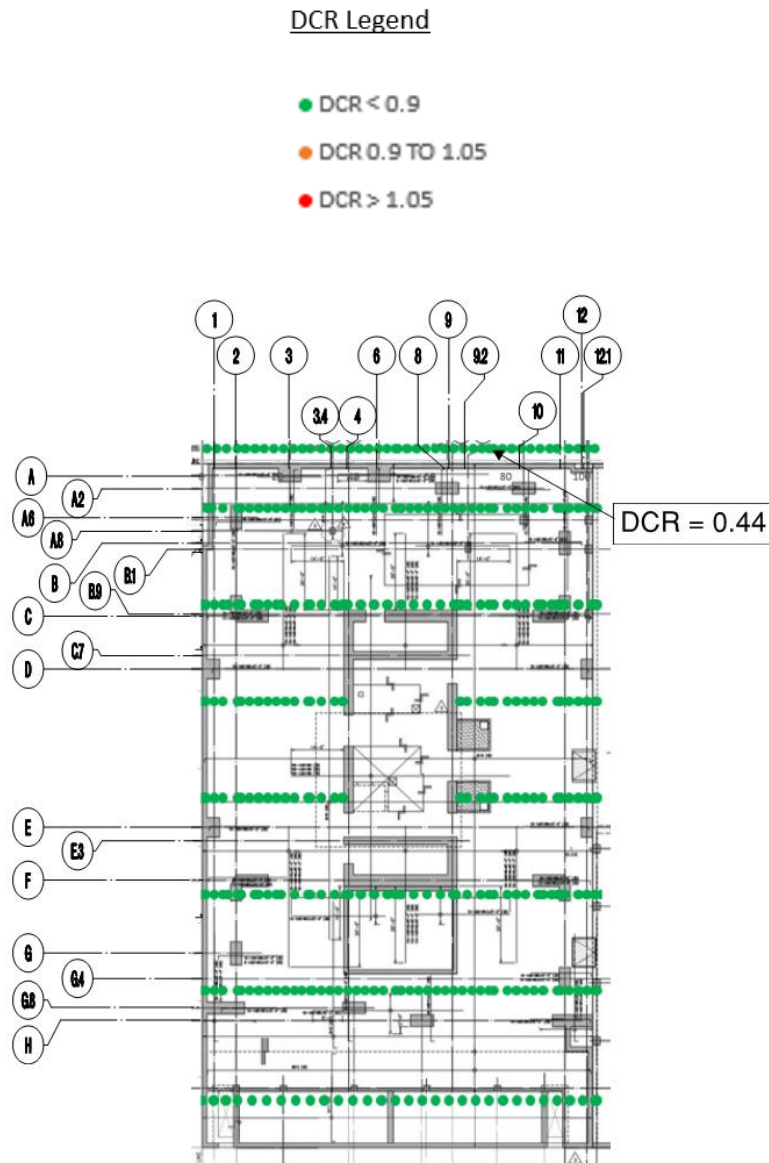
DCR Plot for East-West Bottom Reinforcement Design Strips for Gravity Load Envelope Existing Condition
